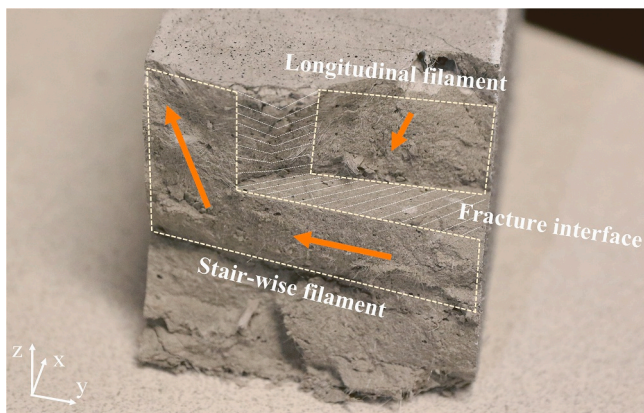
Fracture surface of knitted ECC loaded to complete fracture.
